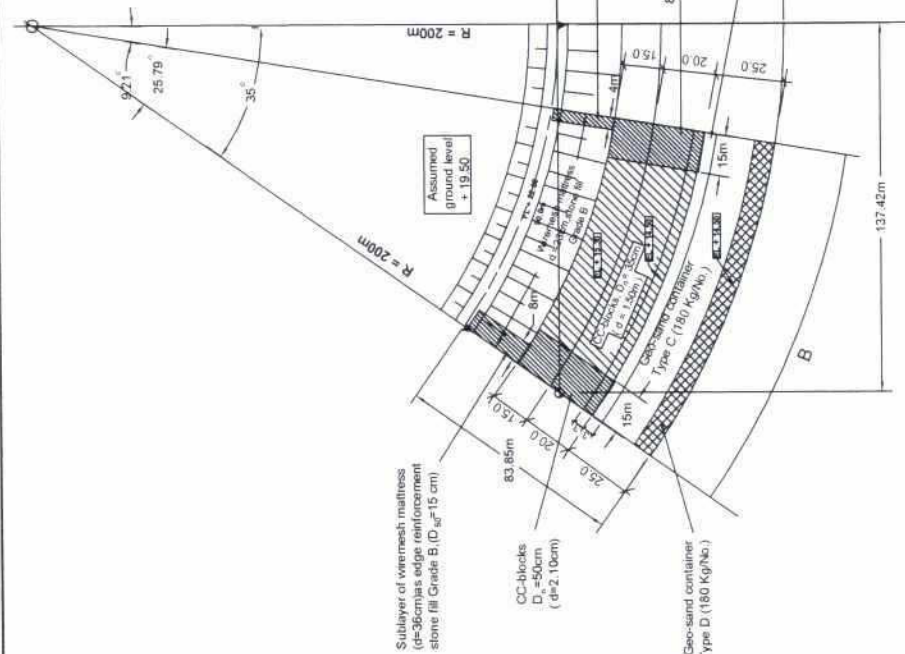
"DUTCH ENVELOPE(Alternative)"
